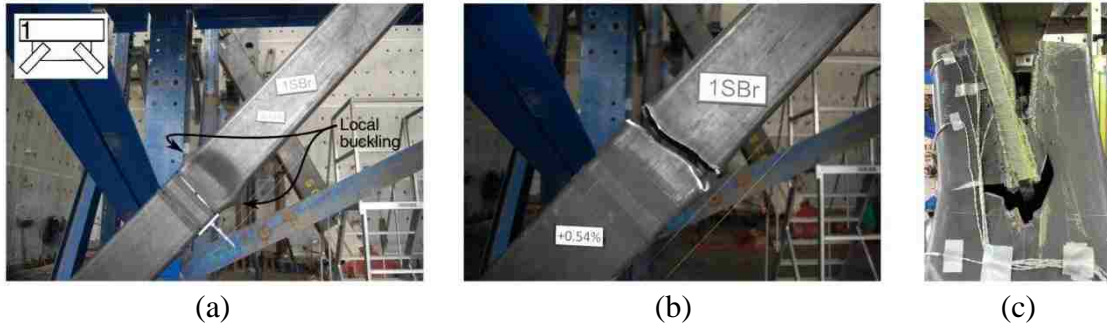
Specimen 1 test: (a) a south first-story brace local buckling; (b) a south first-story brace fracture; (c) north first-story brace-to-gusset plate connection fracture (Sen et al. 2016a)
